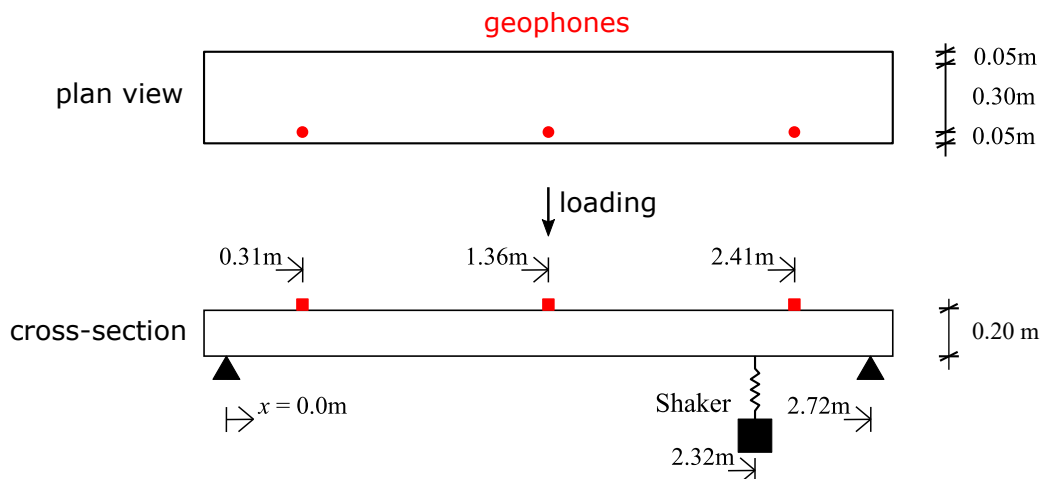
Test setup of the concrete beam with locations of geophones, shaker, and loading for the damage introduction.
